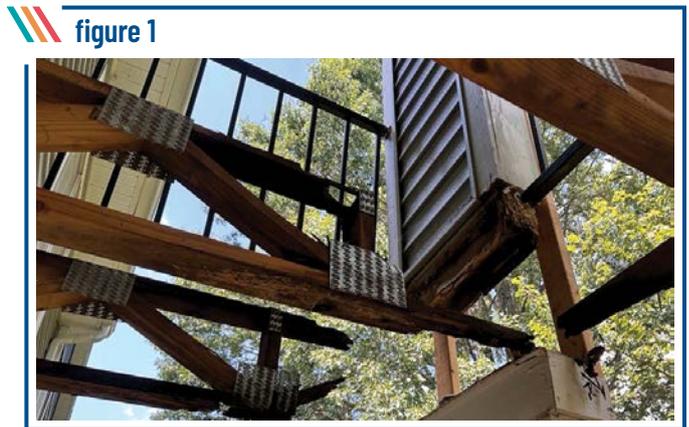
The plate-connected wood trusses were insufficiently protected by the balcony waterproofing, leading to extreme wood decay within just a few years. PHOTOS COURTESY WISS, JANNEY, ELSTNER ASSOCIATES (WJE)
